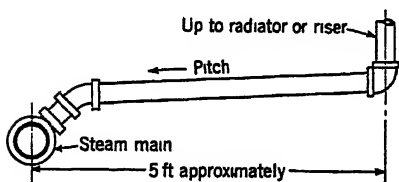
TYPICAL STEAM RUNOUT WHERE RISERS ARE NOT DRIPPED
